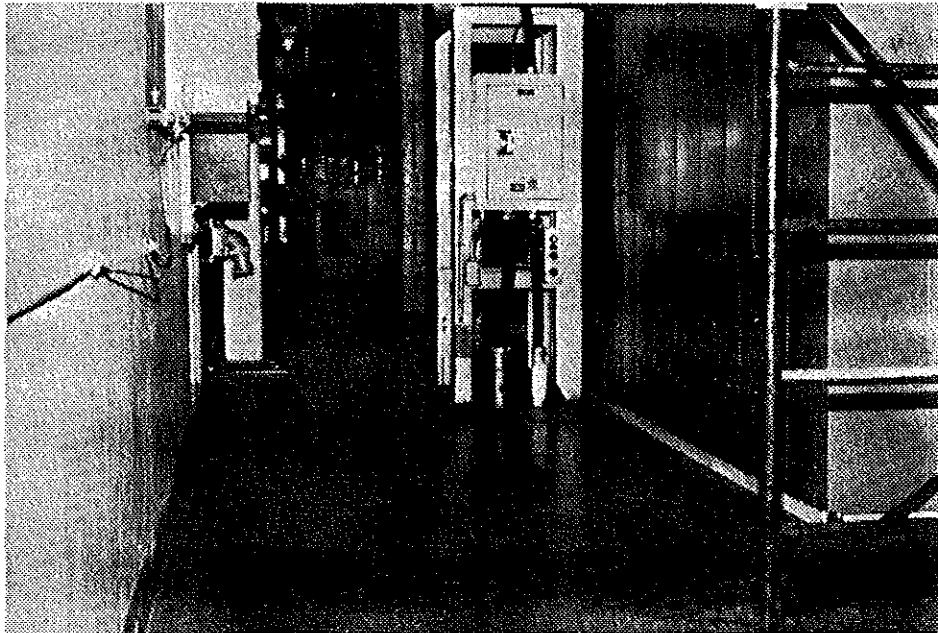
, PRIMARY AUXILIARY BUILDING ELEVATION 25' - 0' (REF. ALLEGATION NO. 19)
